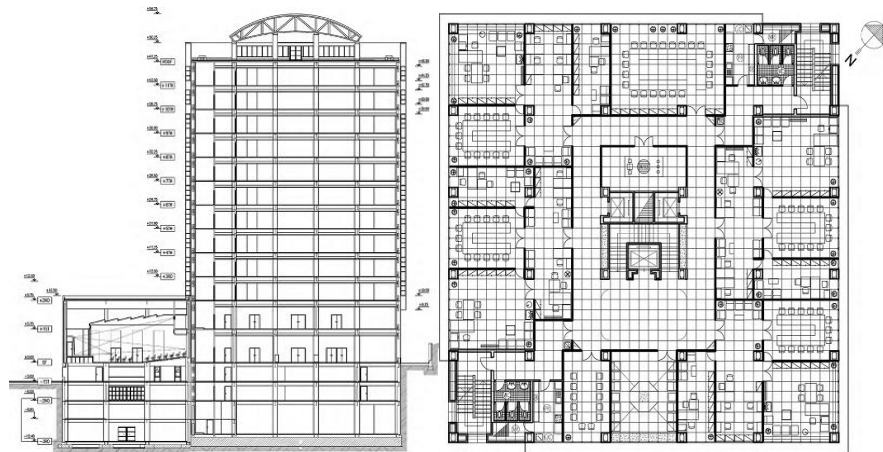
Cross-section of the Case Building, view from south with DSGF on east and west sides (left); Typical floor plan of the case building (right) (Hashemia, et al, 2010: 2-3).
